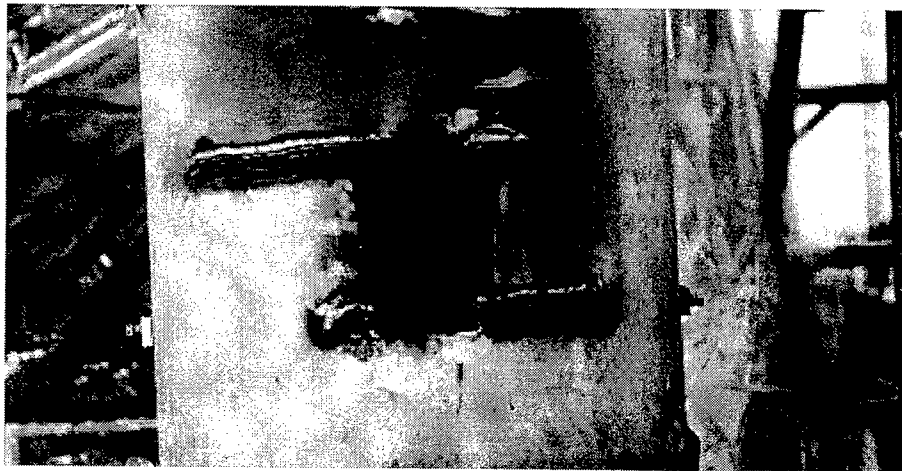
Repair of cracks at the conduit hole for Specimen AB1
